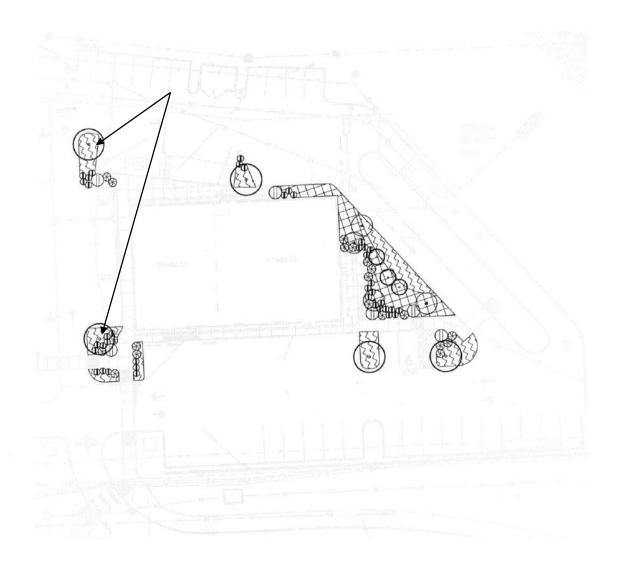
Landscape Plan from Z0243-17-D 04/14/2017
